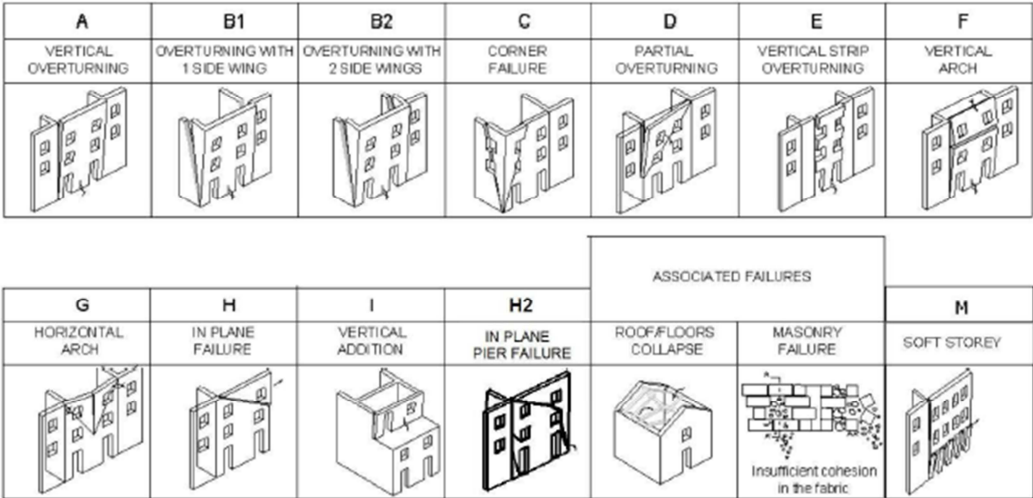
Failure mechanisms for masonry buildings, D’Ayala and Speranza (2003)
